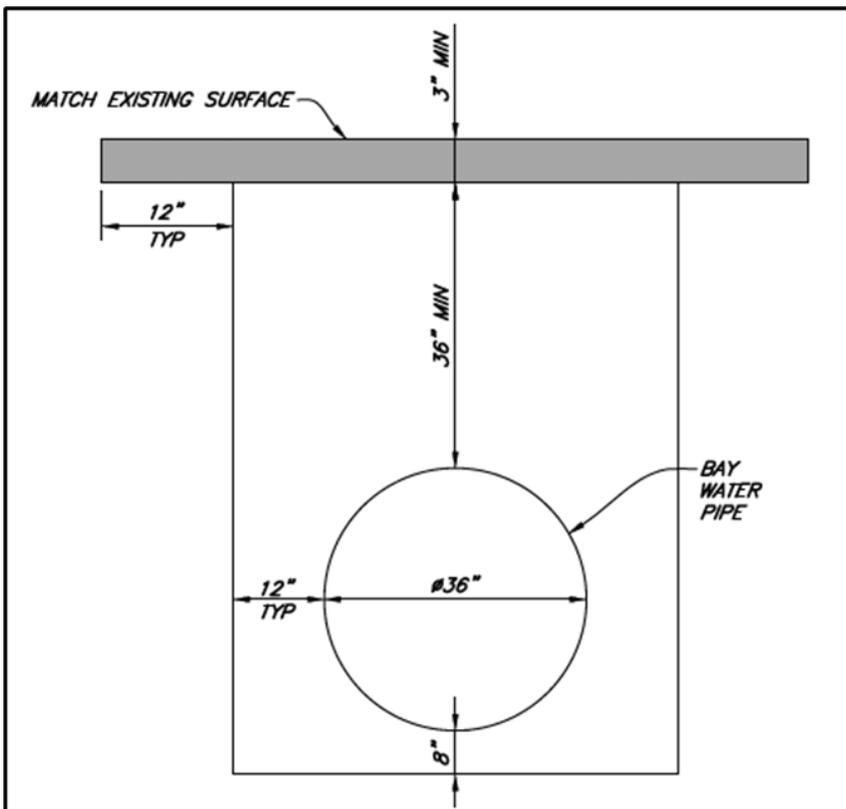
Conceptual Trench Detail in the Area Where Only the 36" Bay Water Line Would Occur
